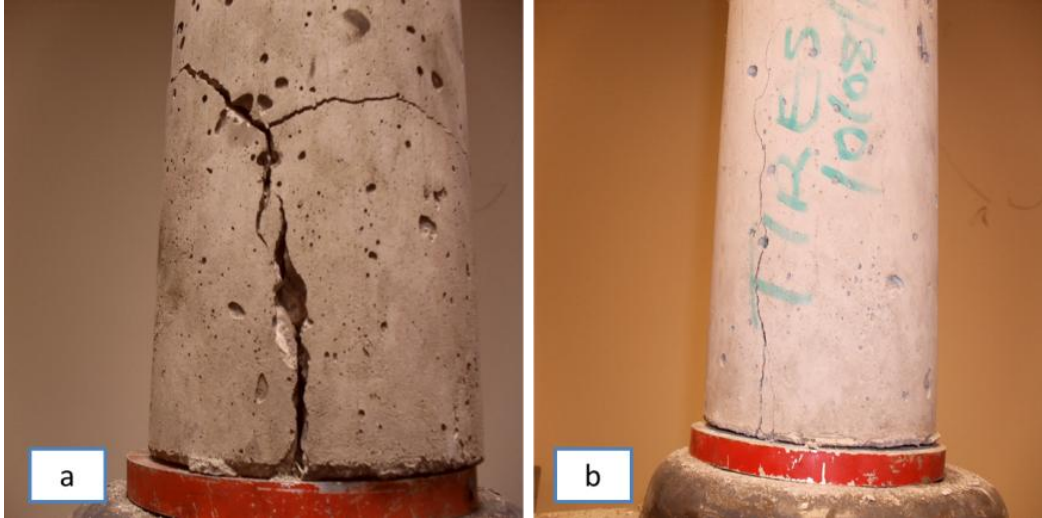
(a) Failure Pattern for Control-0% TDA concrete (b) 7.5% TDA -1" Concrete Failure Pattern during pull-out test. Wide and multiple cracks are noted in the Control-0% TDA concrete while a single crack forms in 7.5% TDA -1" concrete.
